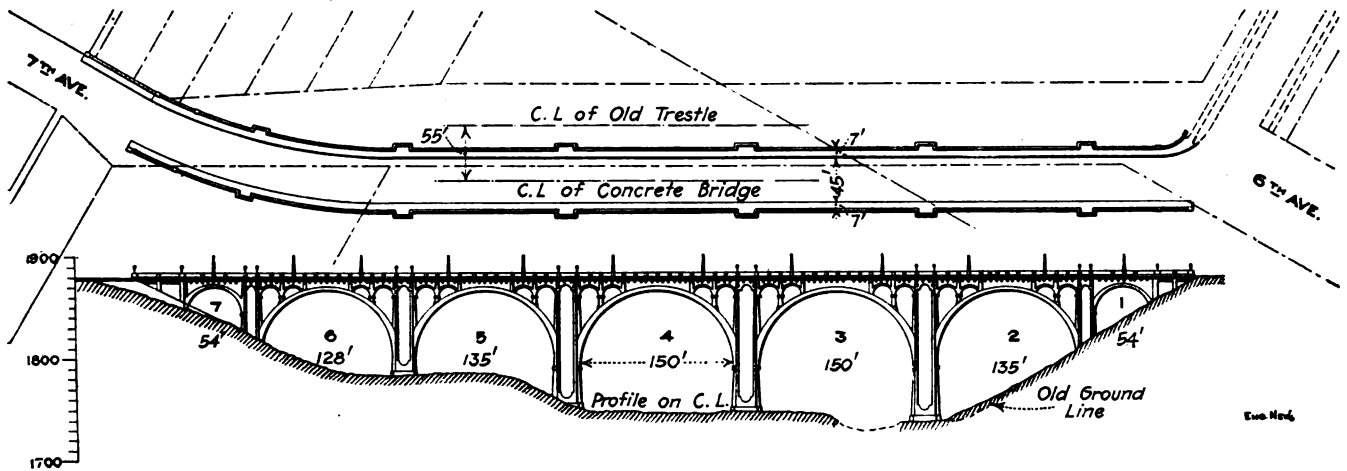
PLAN AND OUTLINE ELEVATION OF THE LATAH CREEK BRIDGE, SPOKANE, WASH.
